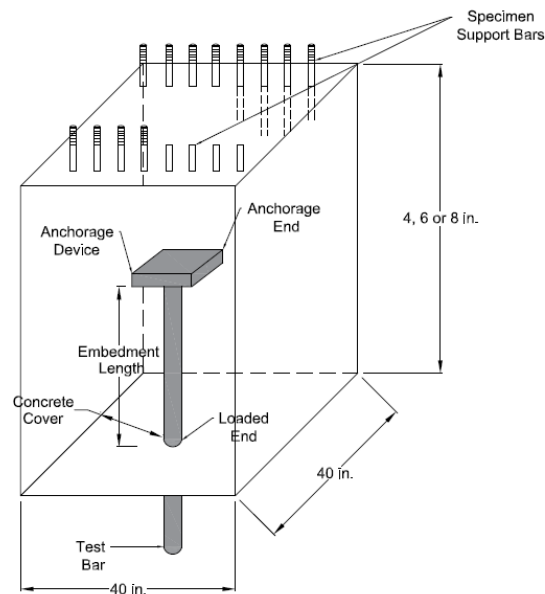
Test specimen with anchorage provided by welded steel end plate (figure after CALTRANS 1974)
